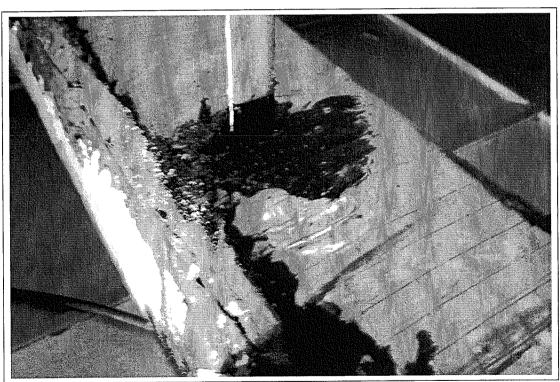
10th floor, in W10111B - Location of dust sample #9 (top of foil wrapped HVAC duct in plenum above suspended ceiling)
